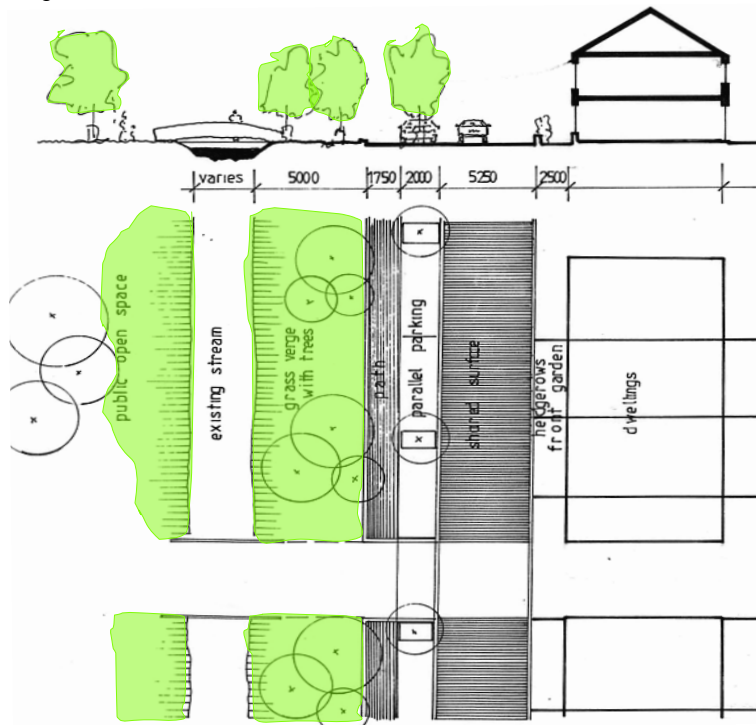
A | Indicative Plan and Section of Streamside Greenway Linkage and Associated Amenities and Development
